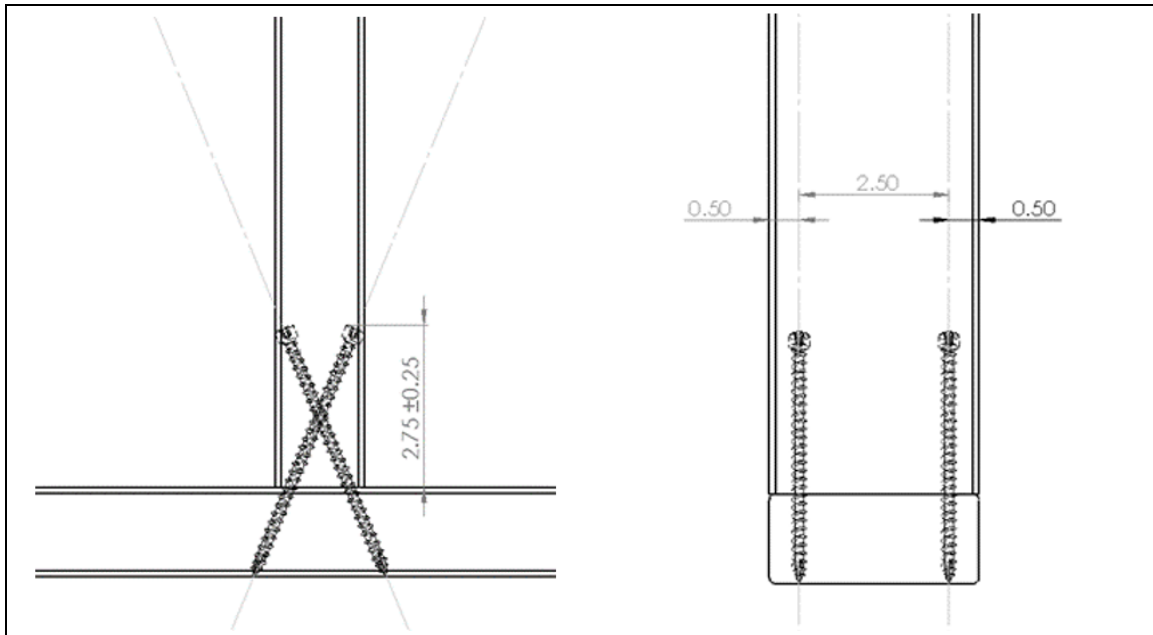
Stud to Bottom Plate – 0° (Perpendicular) Install Options
